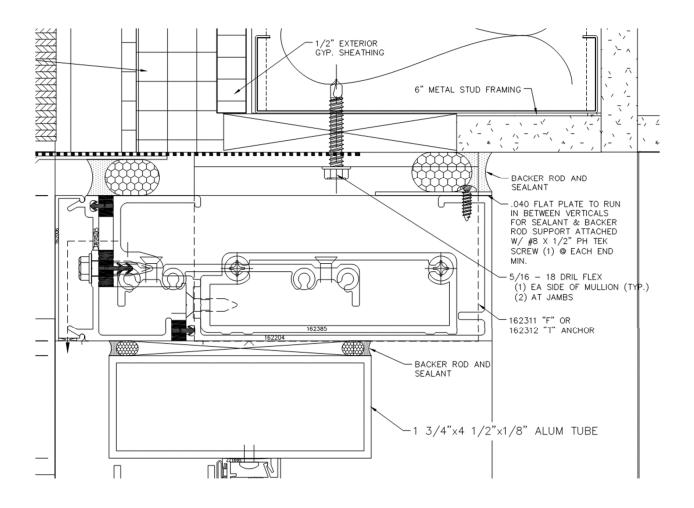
HEAD ANCHOR INTO LIGHT GAGE
